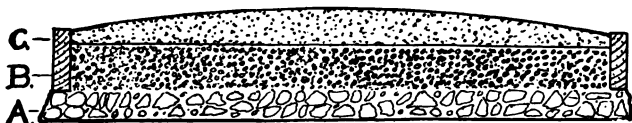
Structure of a concrete walk. a, foundation; b, coarse concrete; c, finish coat of fine concrete
